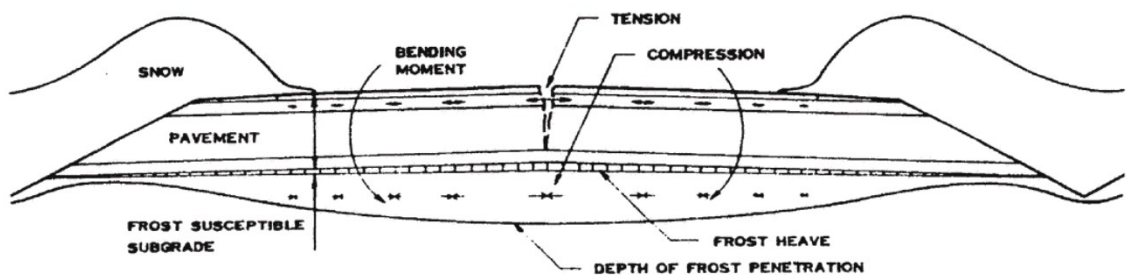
Longitudinal cracking of pavement due to differential frost heave (Nordal and Refsdal, 1989).
